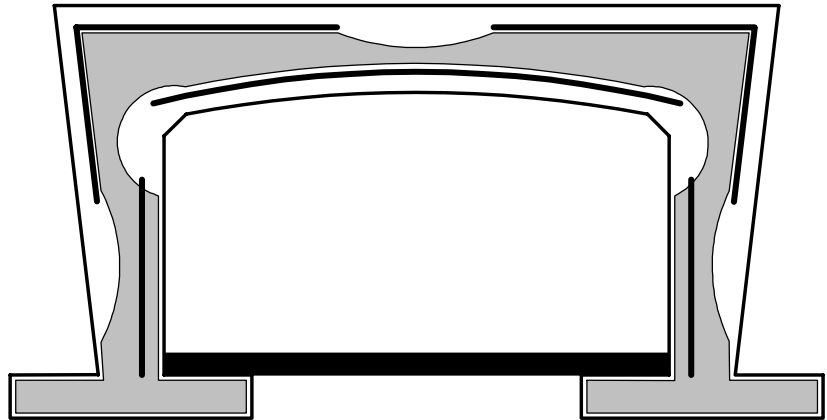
Shear Zones in Single Span and Multi-span Frames
